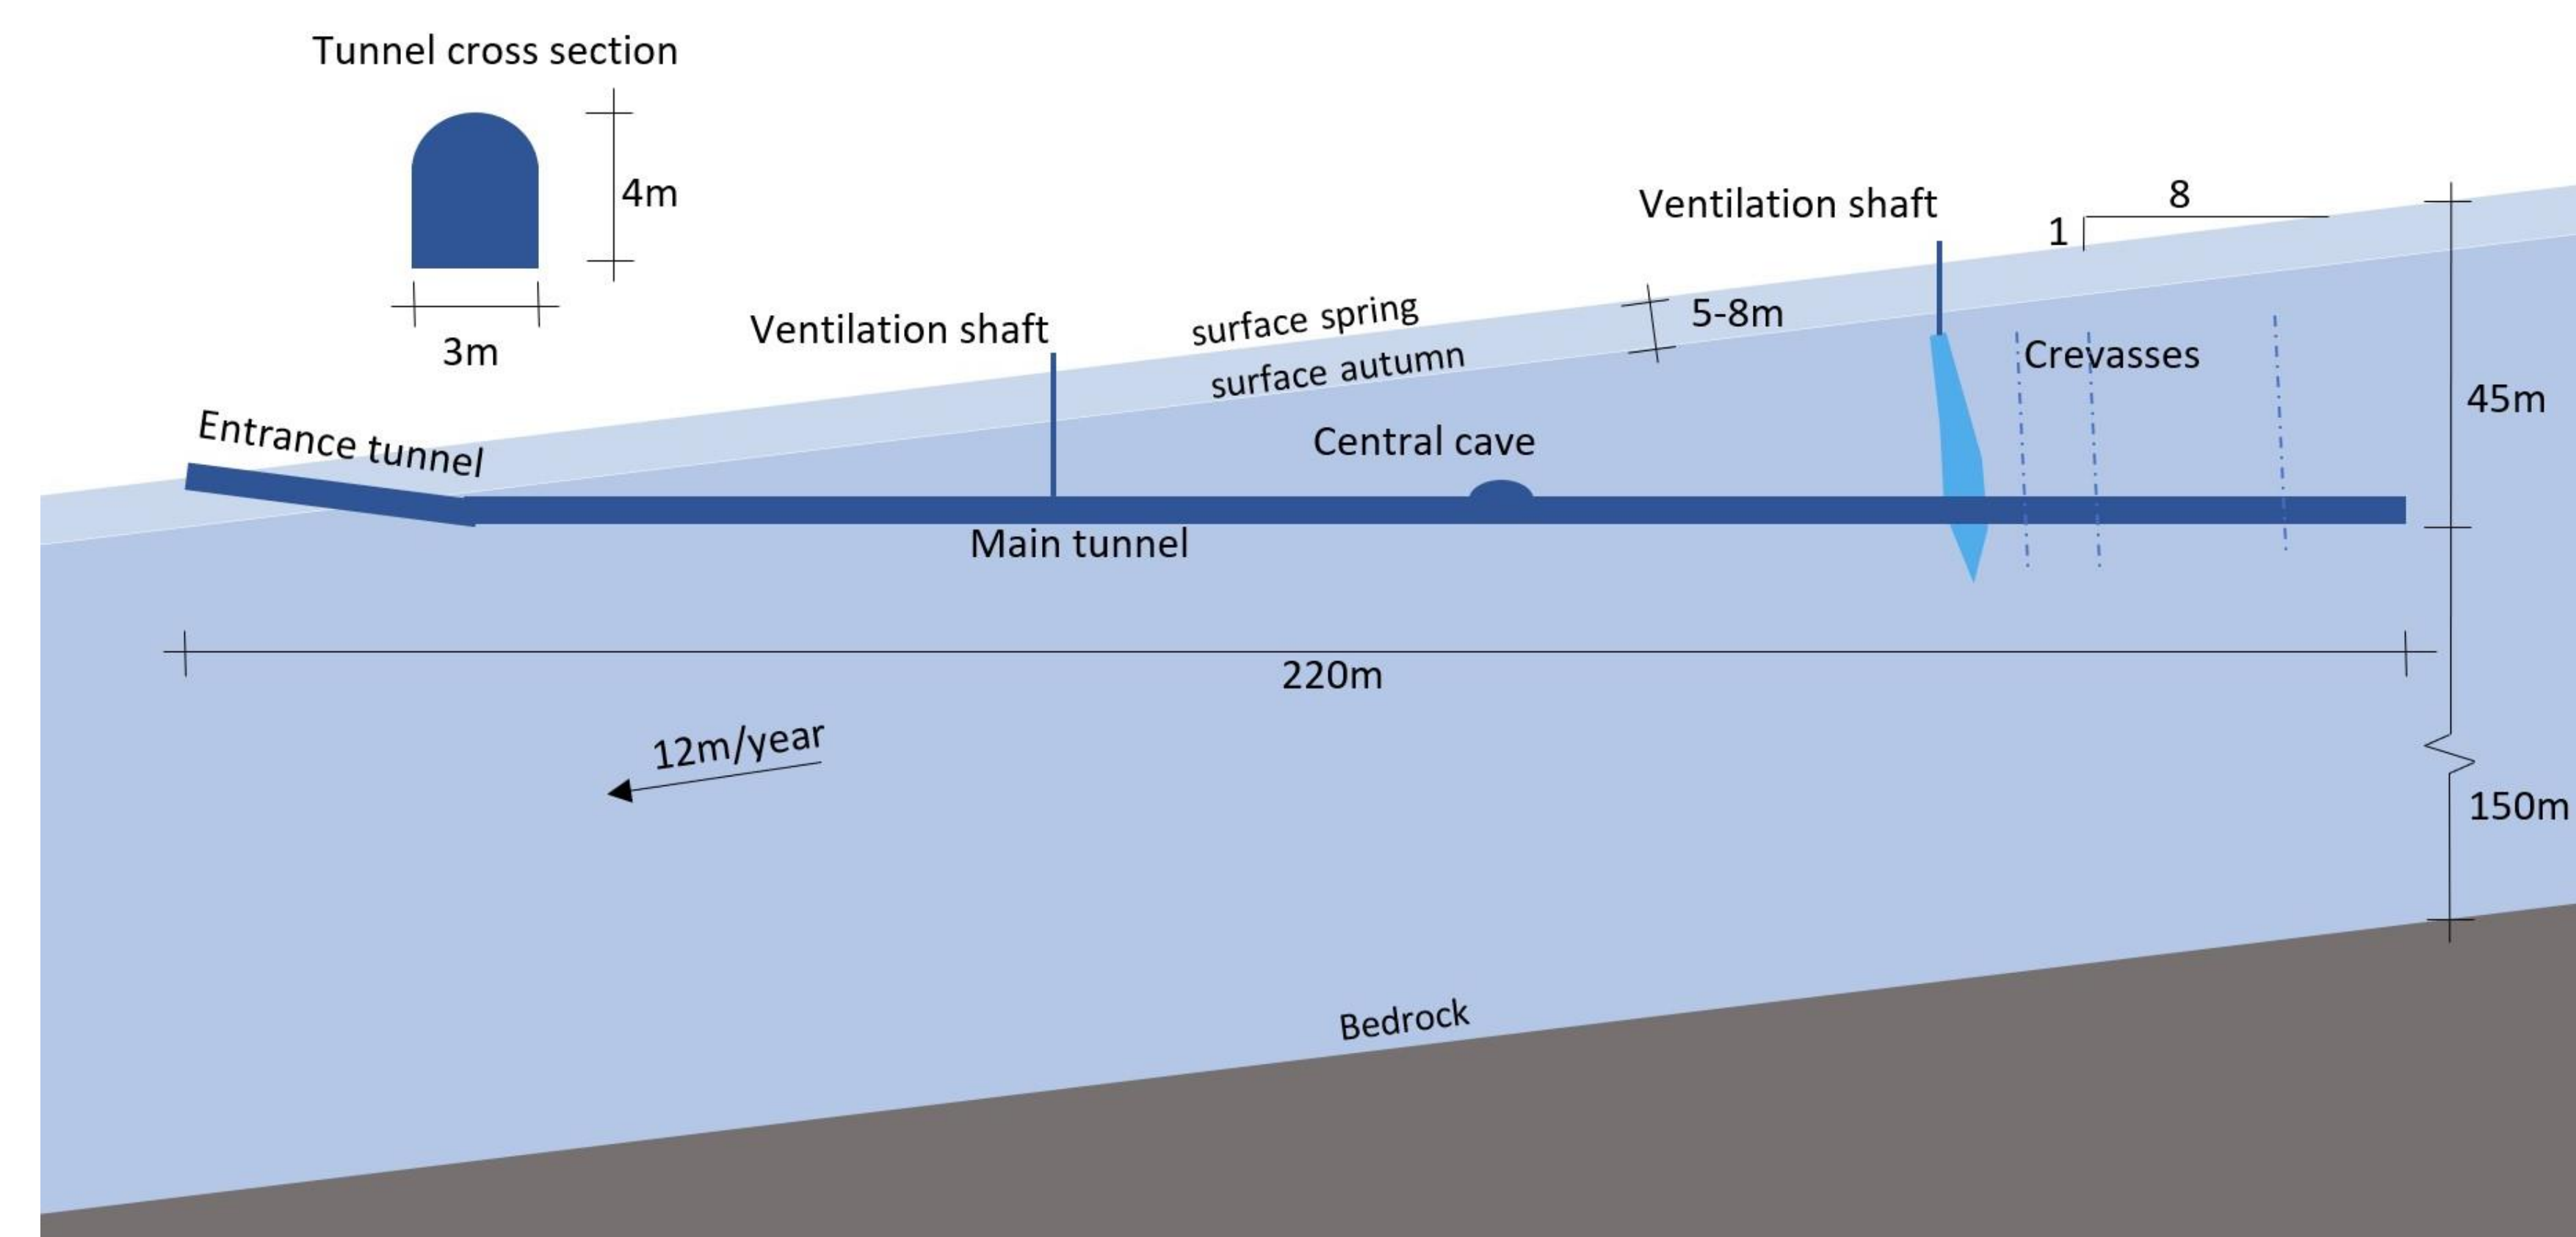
Cross-section and longitudinal profile of the ice tunnel.
